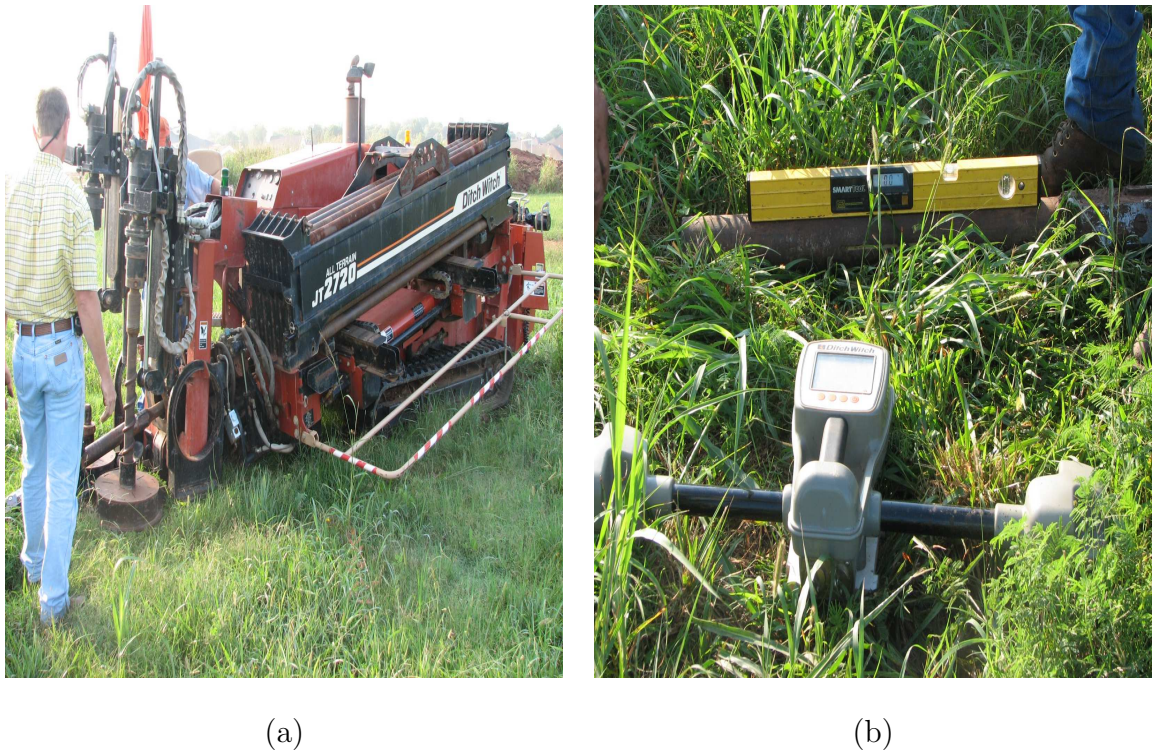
(a) Set-up of the Drilling Equipment (b) Calibration of the beacon
